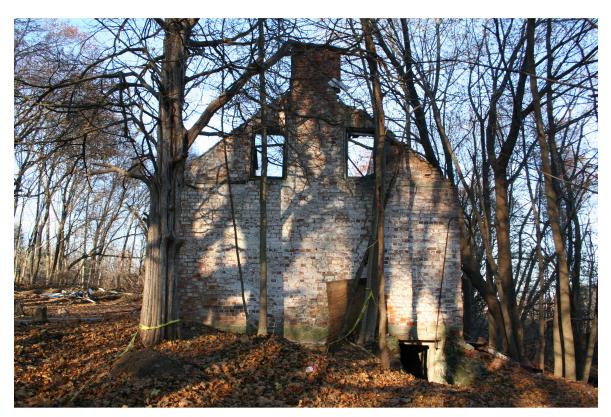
South elevation of the Peter McCutcheon House, facing northwest.
